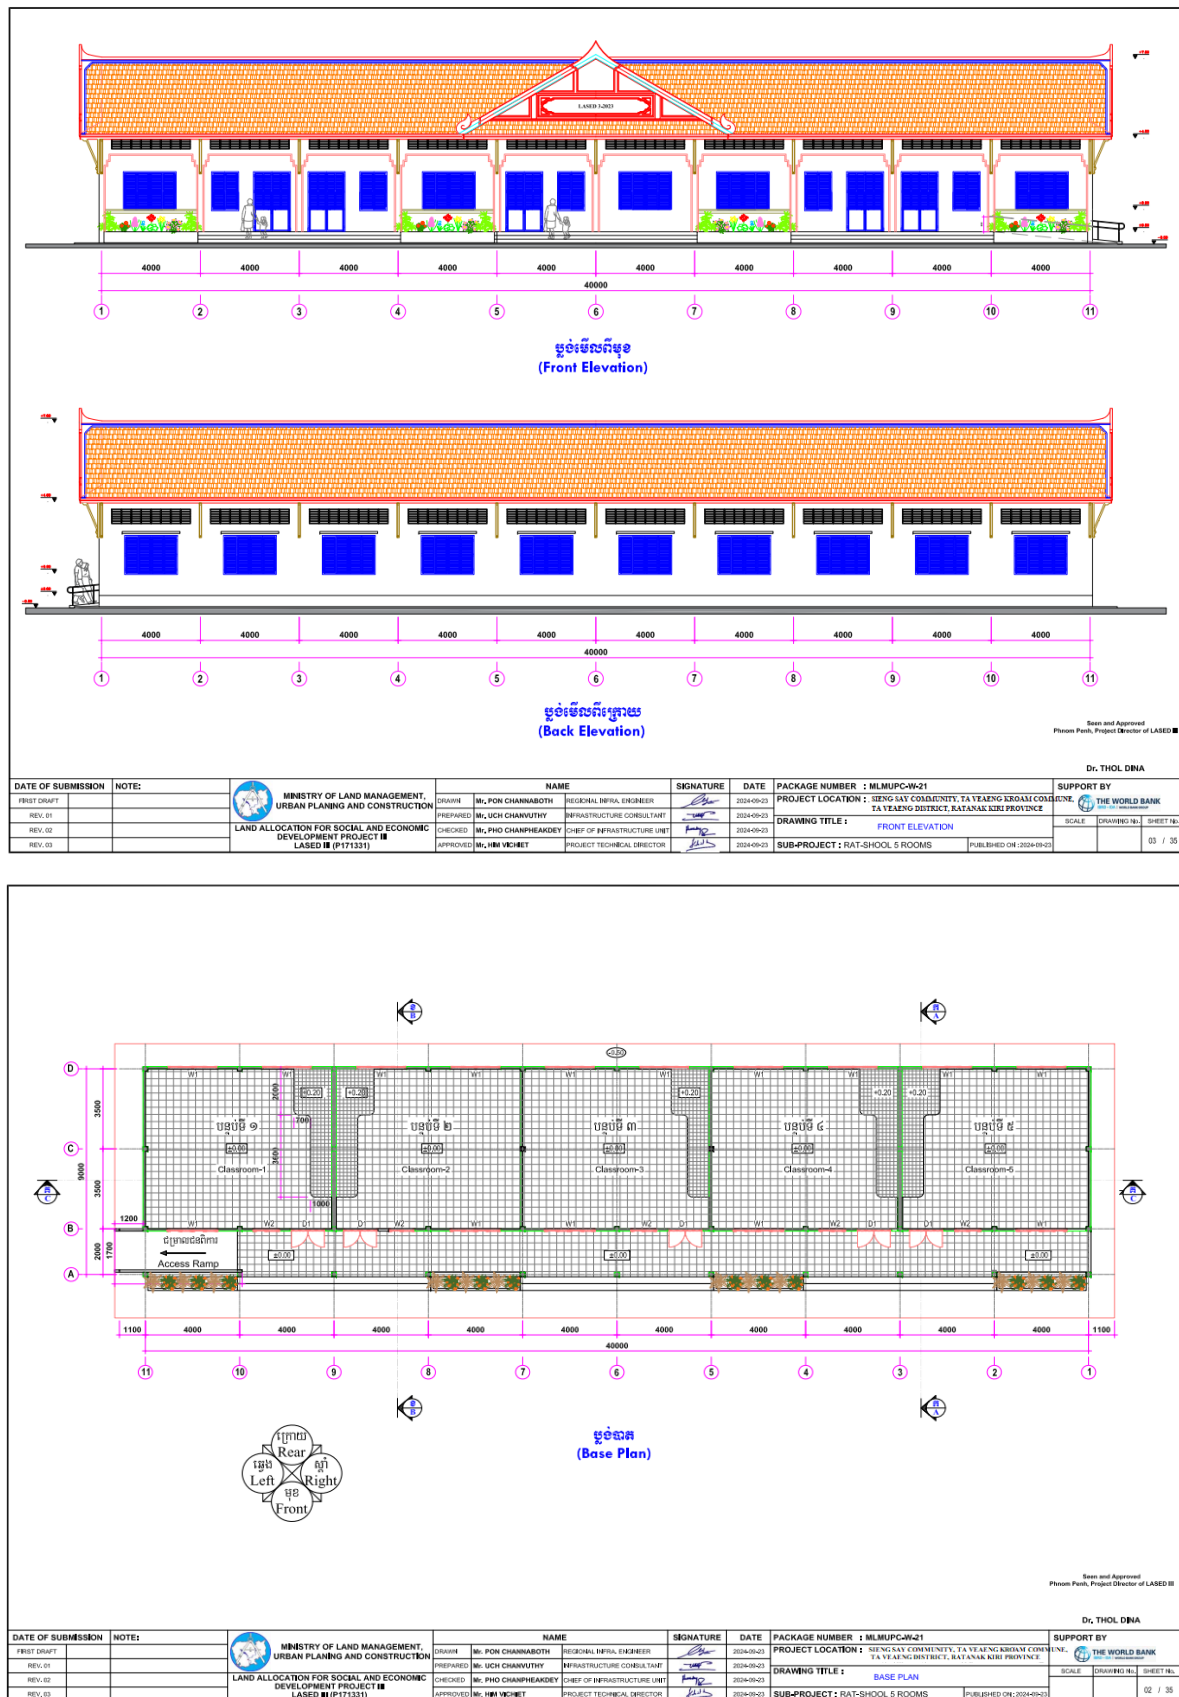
Detailed drawing design for one concrete primary school with five classrooms
